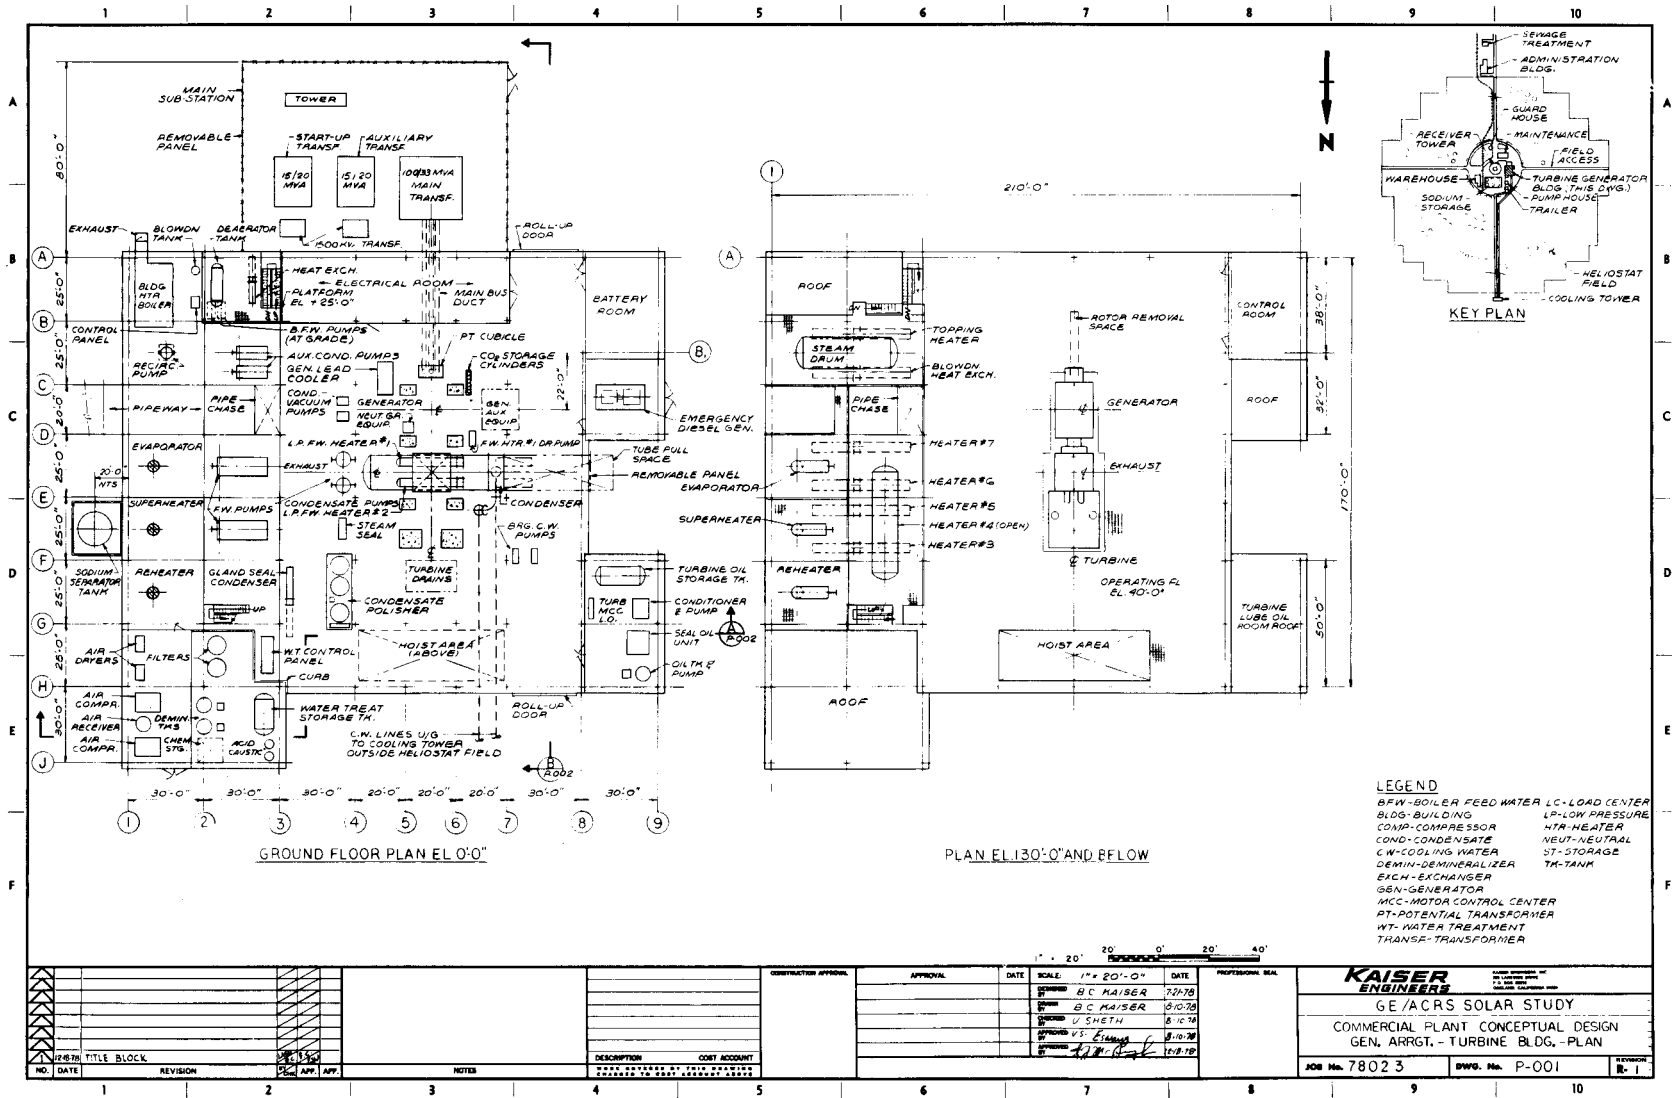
General Arrangement - Turbine Building Plan Views
